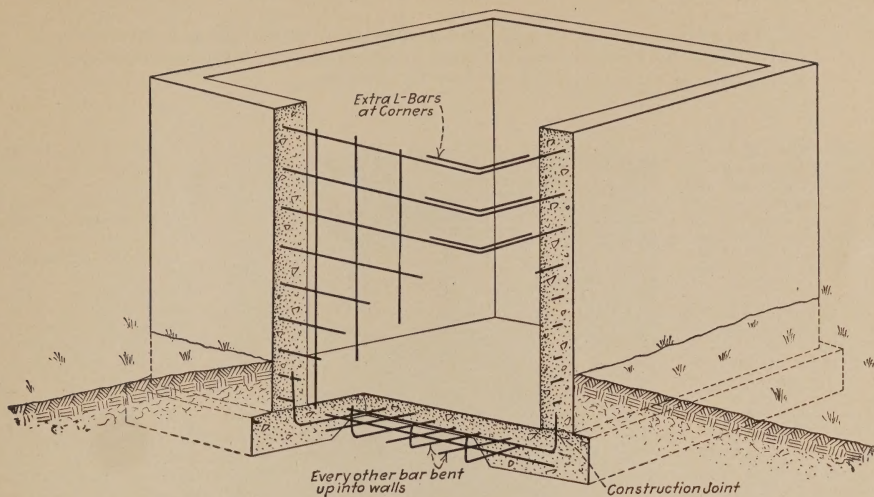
Drawing of concrete tank or cistern located partly above ground. Footings and floor are carried below ground sufficient to extend below frost line.
